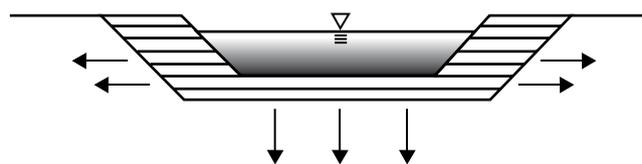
D-7 Bathtub construction of clay liner (photo courtesy of NRCS Virginia)
